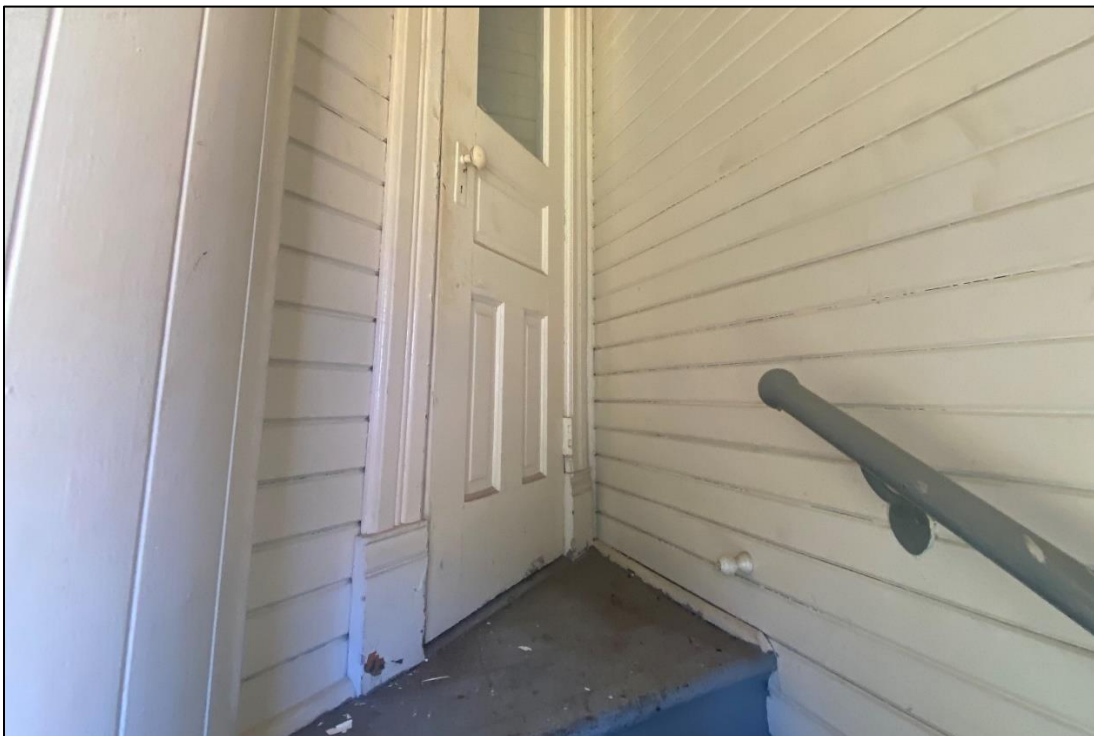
of 46: Light Tower interior stairwell leading up to lantern room from engine room in attached Fog Signal Building.
